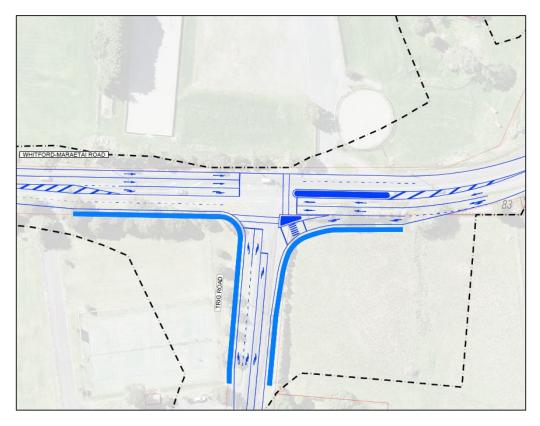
Proposed Upgrade to Whitford Maraetai Road / Trig Road (south) intersection
